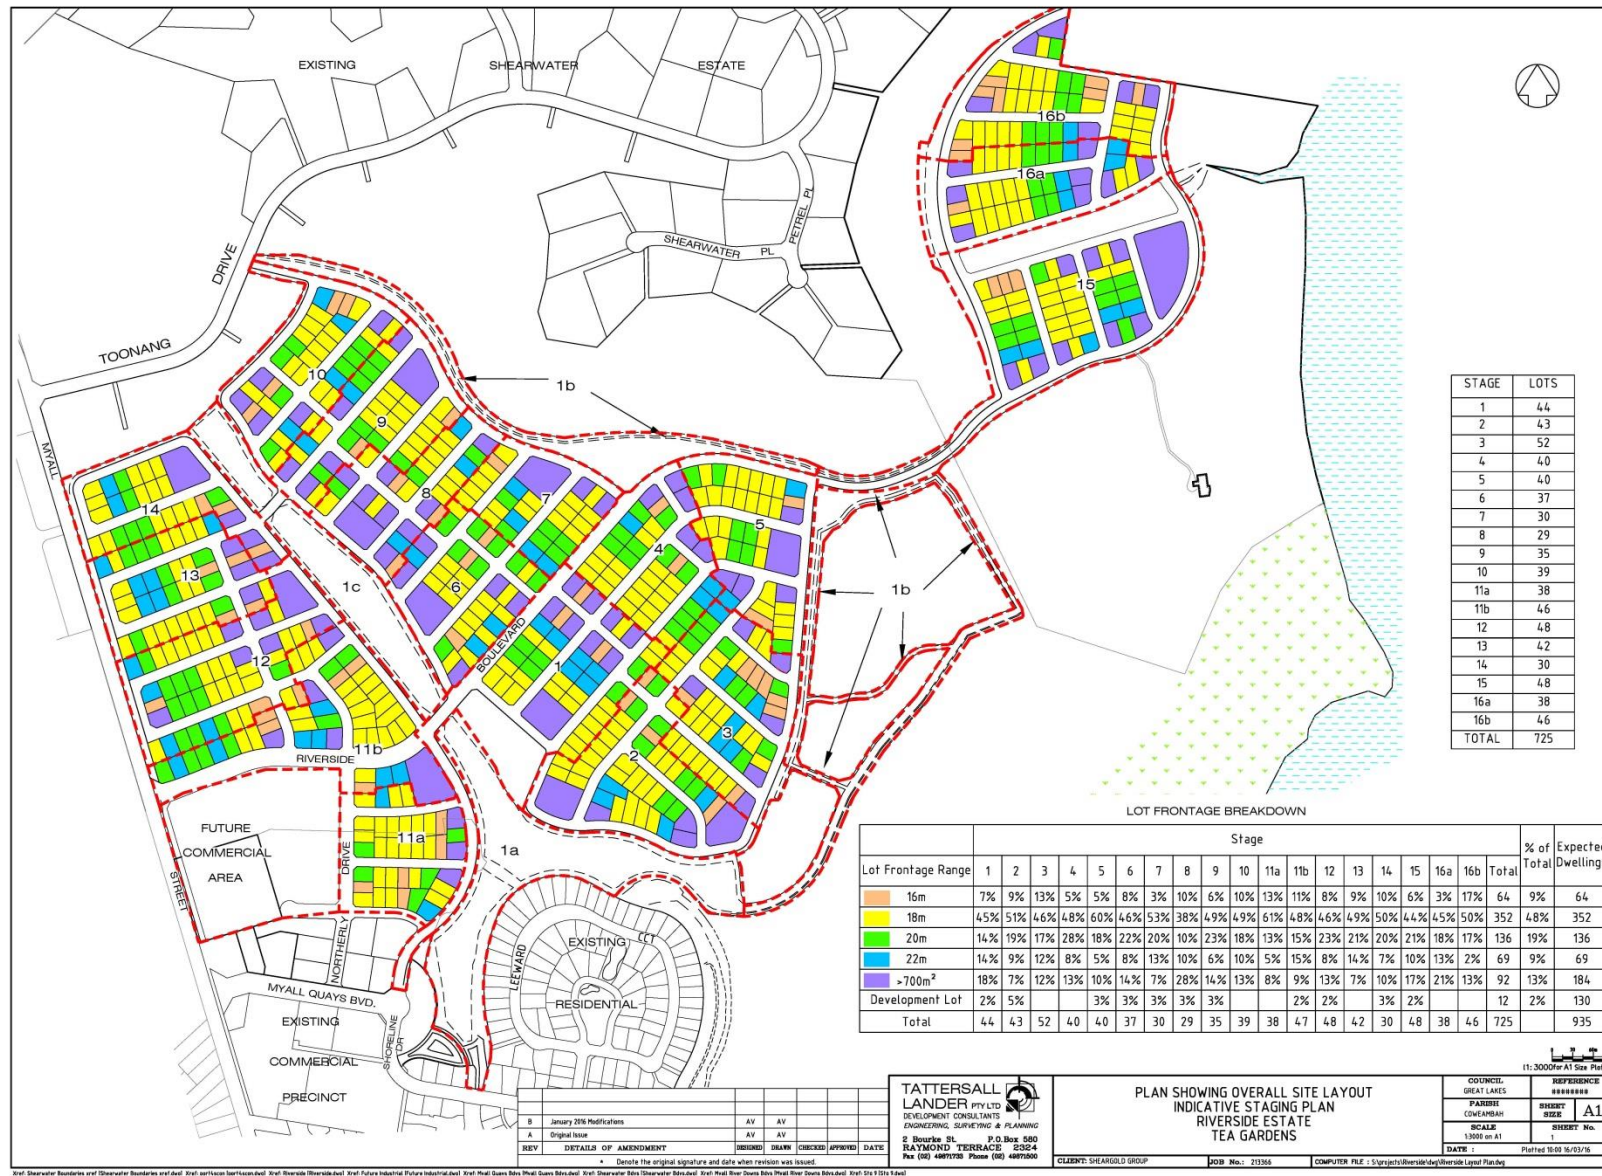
DoP Concept Plan Approved Developable Footprint with PPR Layout
